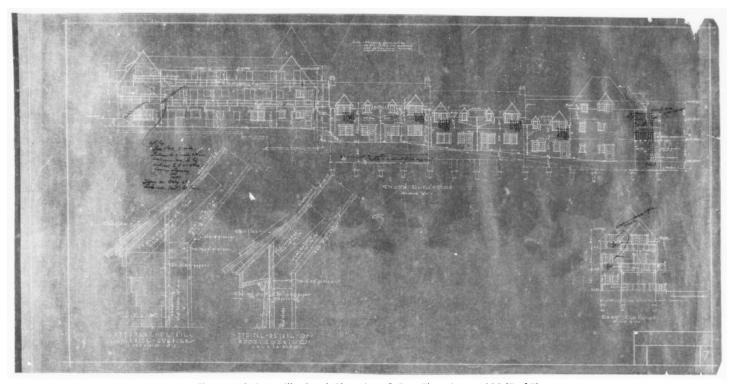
Beauville, South Elevations & East Elevation – 1928 (7 of 7)
